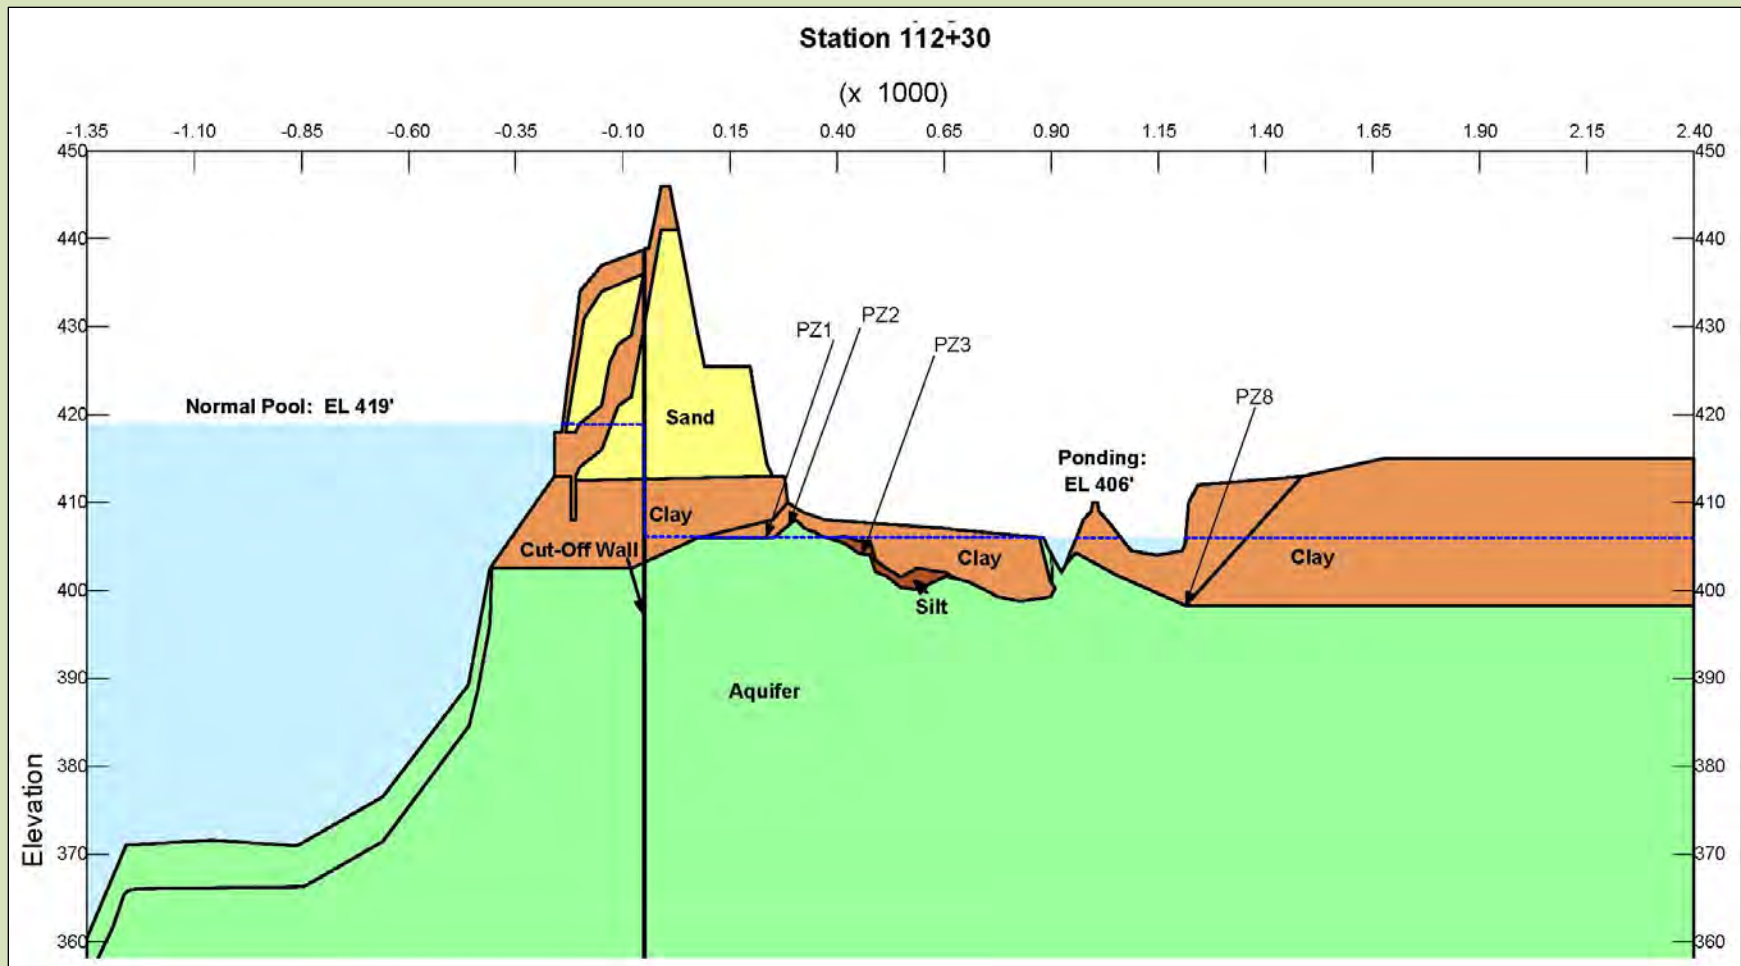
Modeled Groundwater Surface Elevation (dashed blue line) under Tentatively Selected Plan (cutoff wall) at Sta. 112+30.
